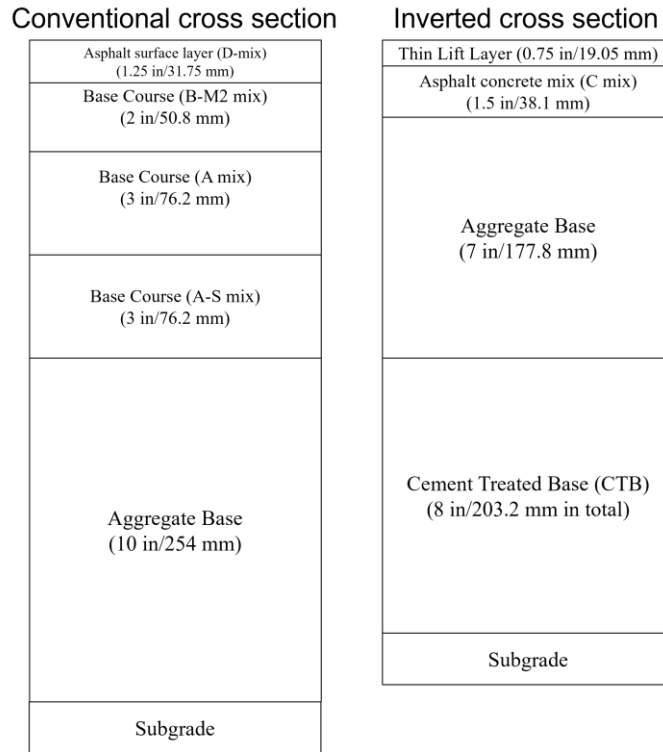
The conventional and inverted pavement test sections in Chattanooga, TN.
